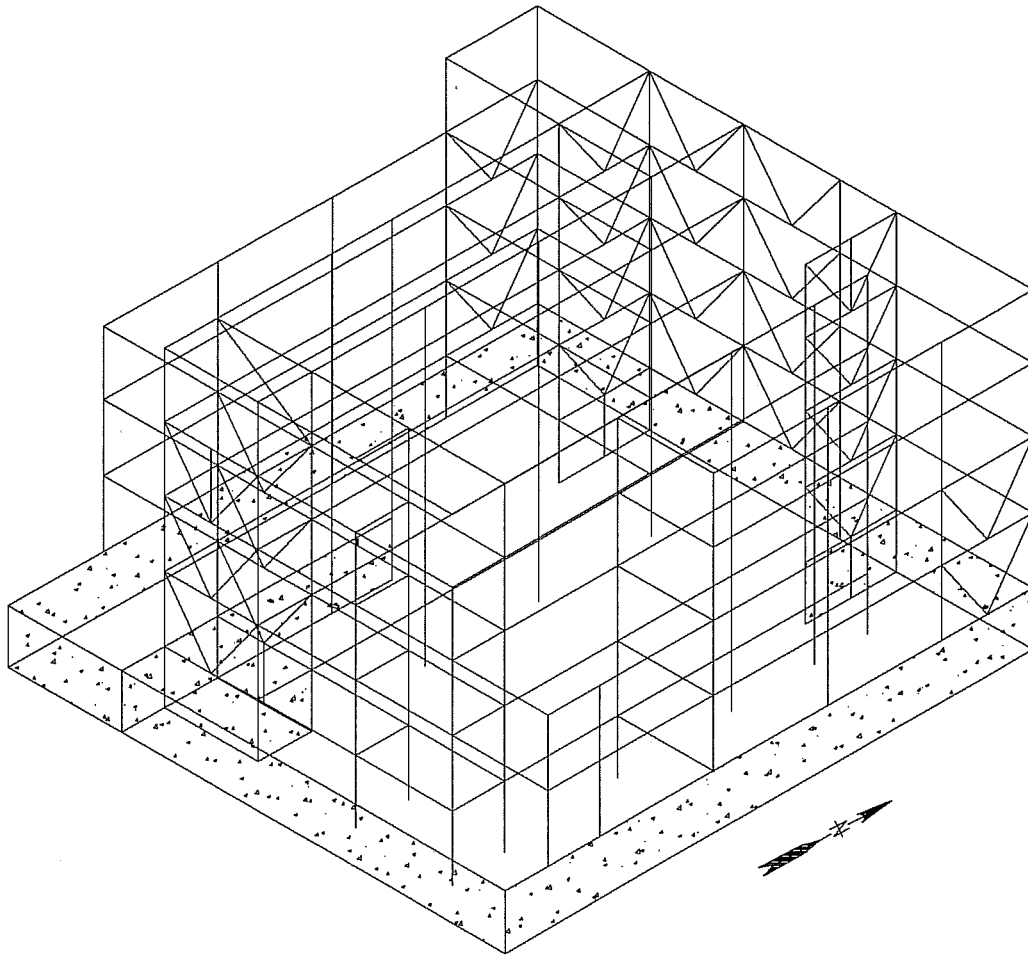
Peninsula Office Building - Three-Dimensional View of Building Model
